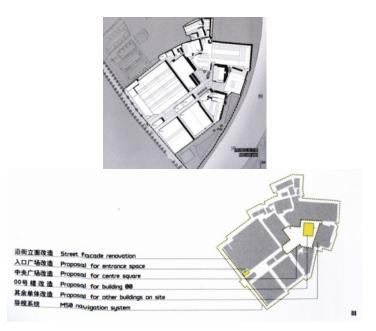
Site plan and building renovation project locations by DAtrans. Reprinted from Secondhand Modern, DAtrans, (Beijing, 2008)
